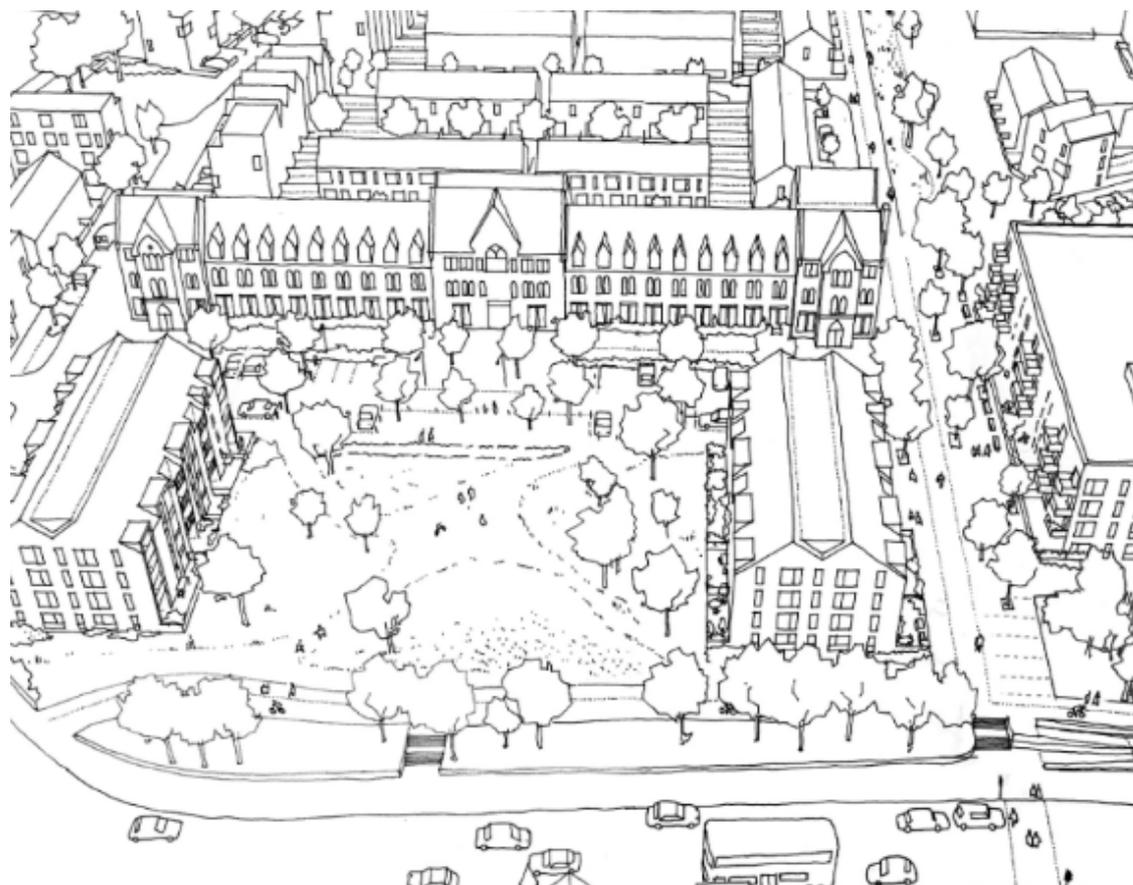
indicative illustration to show retained Infirmary Front Range and new apartments to south and east of this and dwellings to the north and west.
